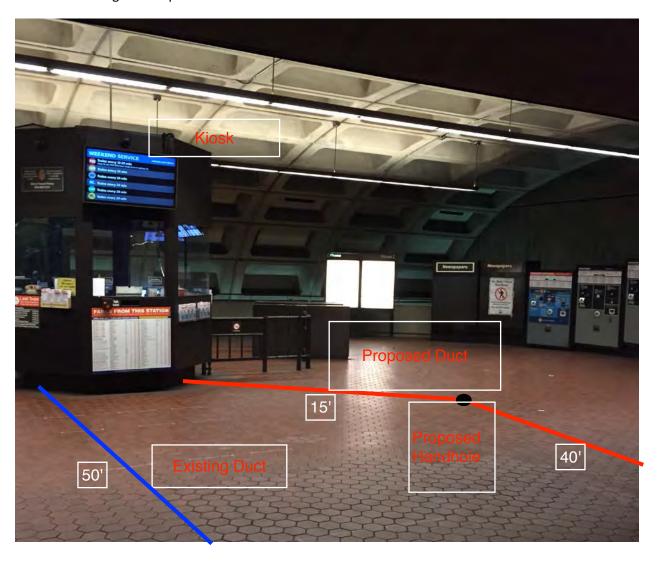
Existing and Proposed Duct/Conduit on mezzanine floor
